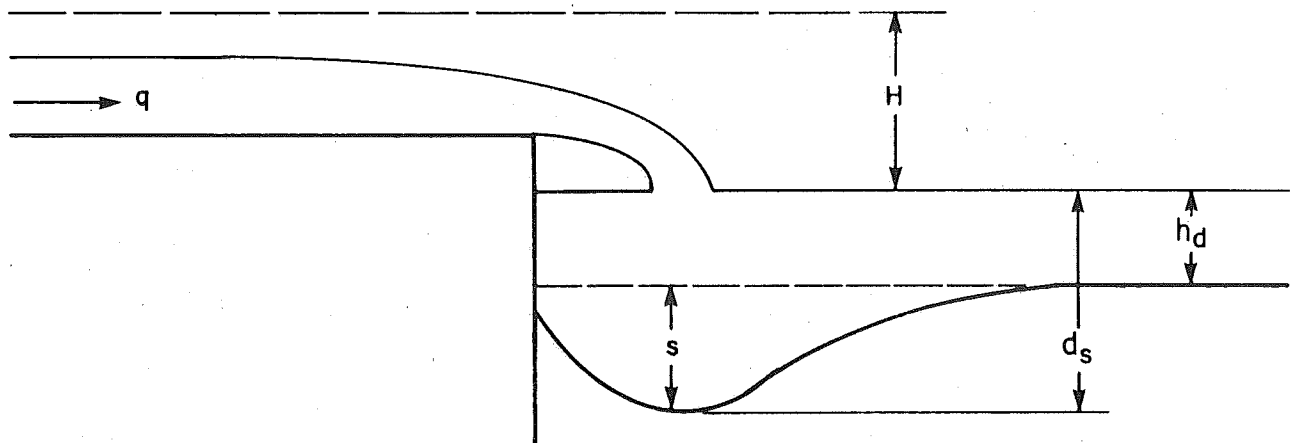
Erosion that can take place downstream of hydraulic structures.
